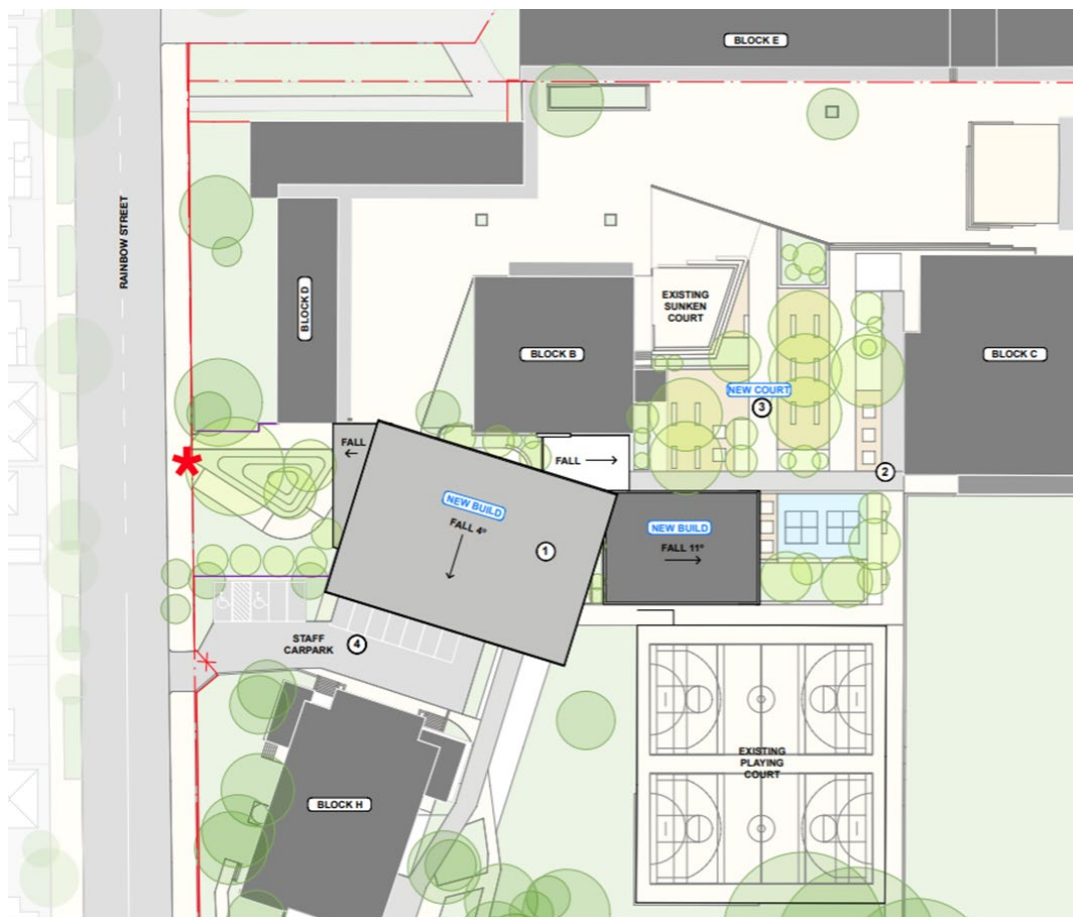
Extract of proposed Site Plan (Bennett and Trimble, 2025)
